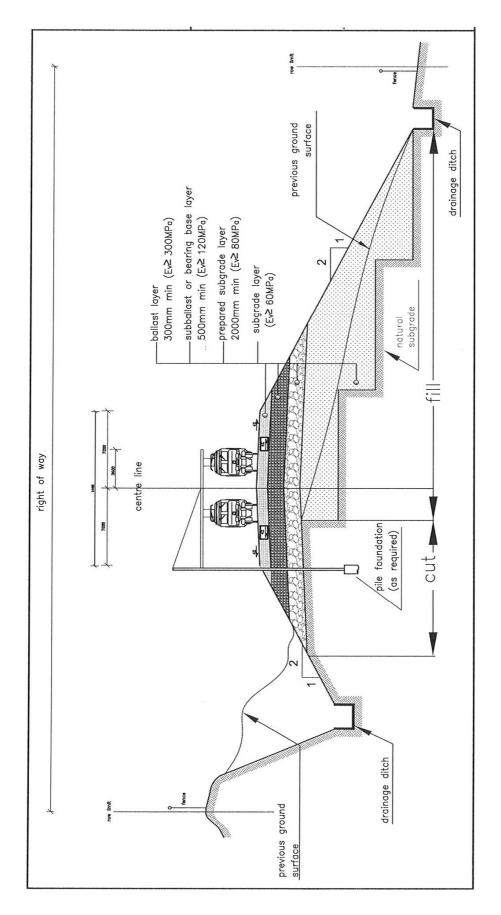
Typical cross-section in a mixed (cut-fill) portion of a high-speed train embankment usable globally
